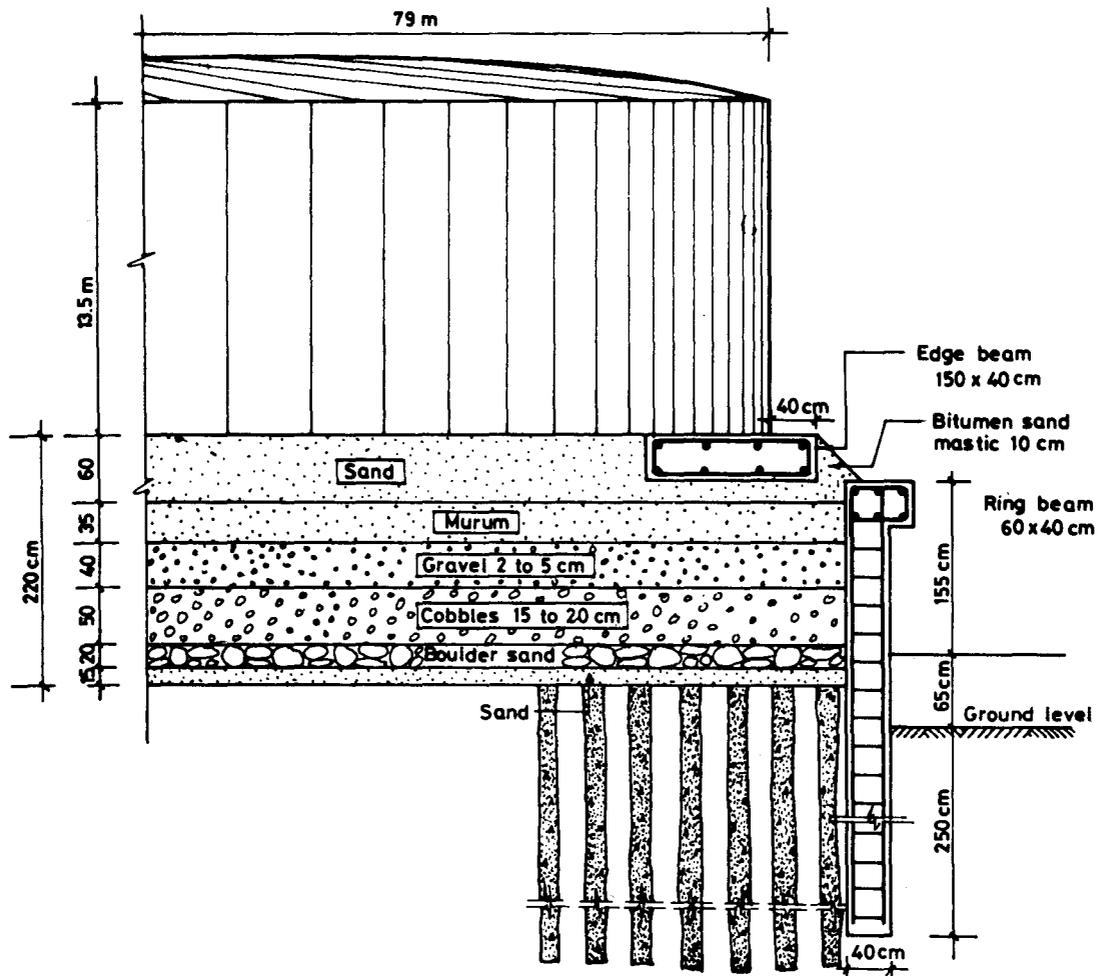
Detail of flexible pad skirt edge beam ring beam etc.
